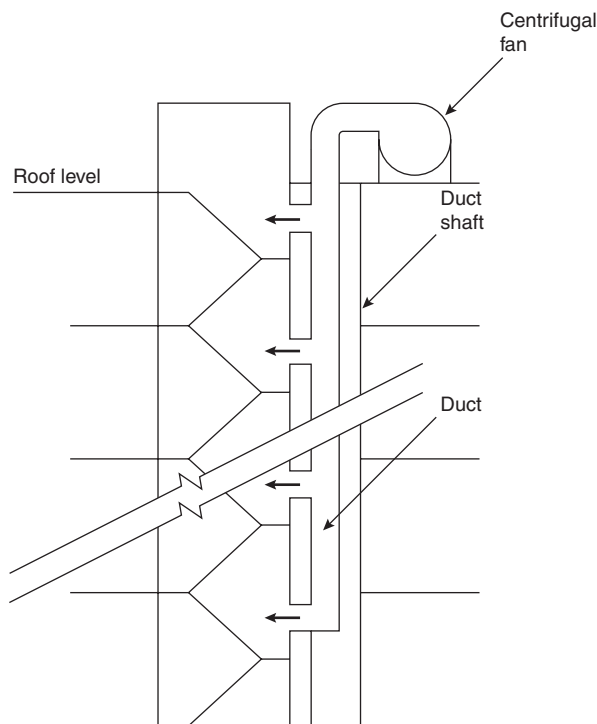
Stairwell pressurization by multiple injection with roof-mounted fan.
